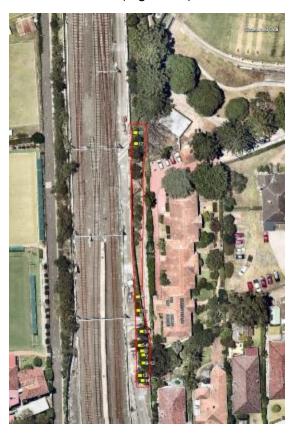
Hopetoun Avenue ramp north towards Chatswood Oval
